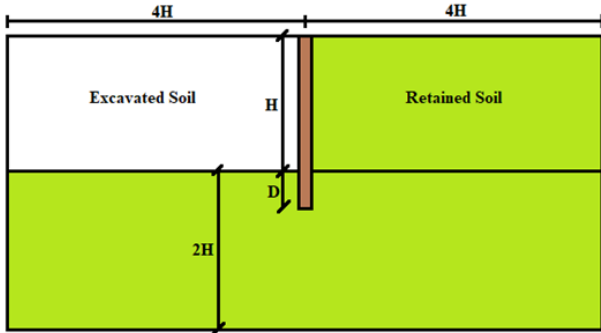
Minimum model limits for sheet pile wall (Bilgin, 1994)
